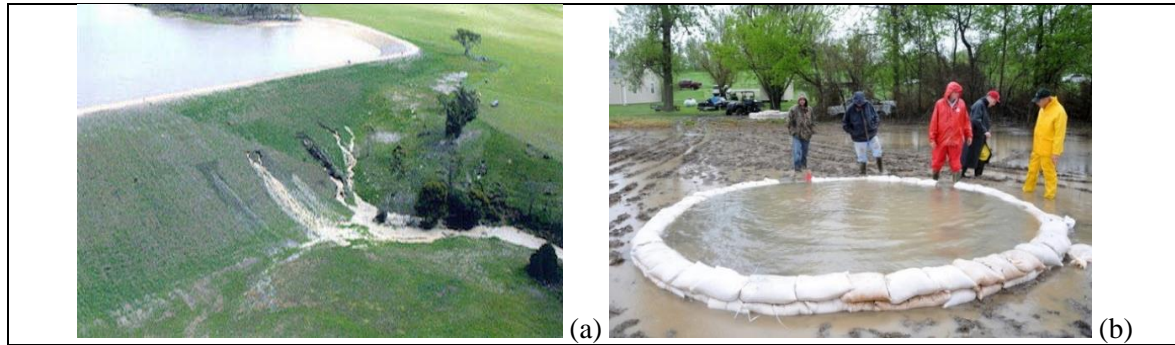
Internal erosion failure [13] (a) and hydraulic heave in Podturen, north Croatia (b)
